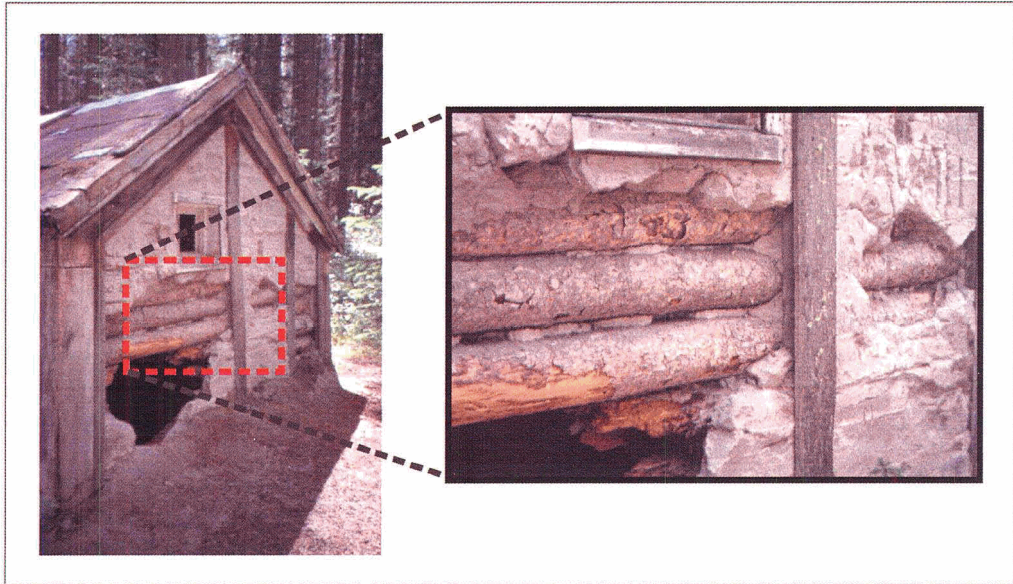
Detail of layered building materials on structure exterior (room B, side A).
